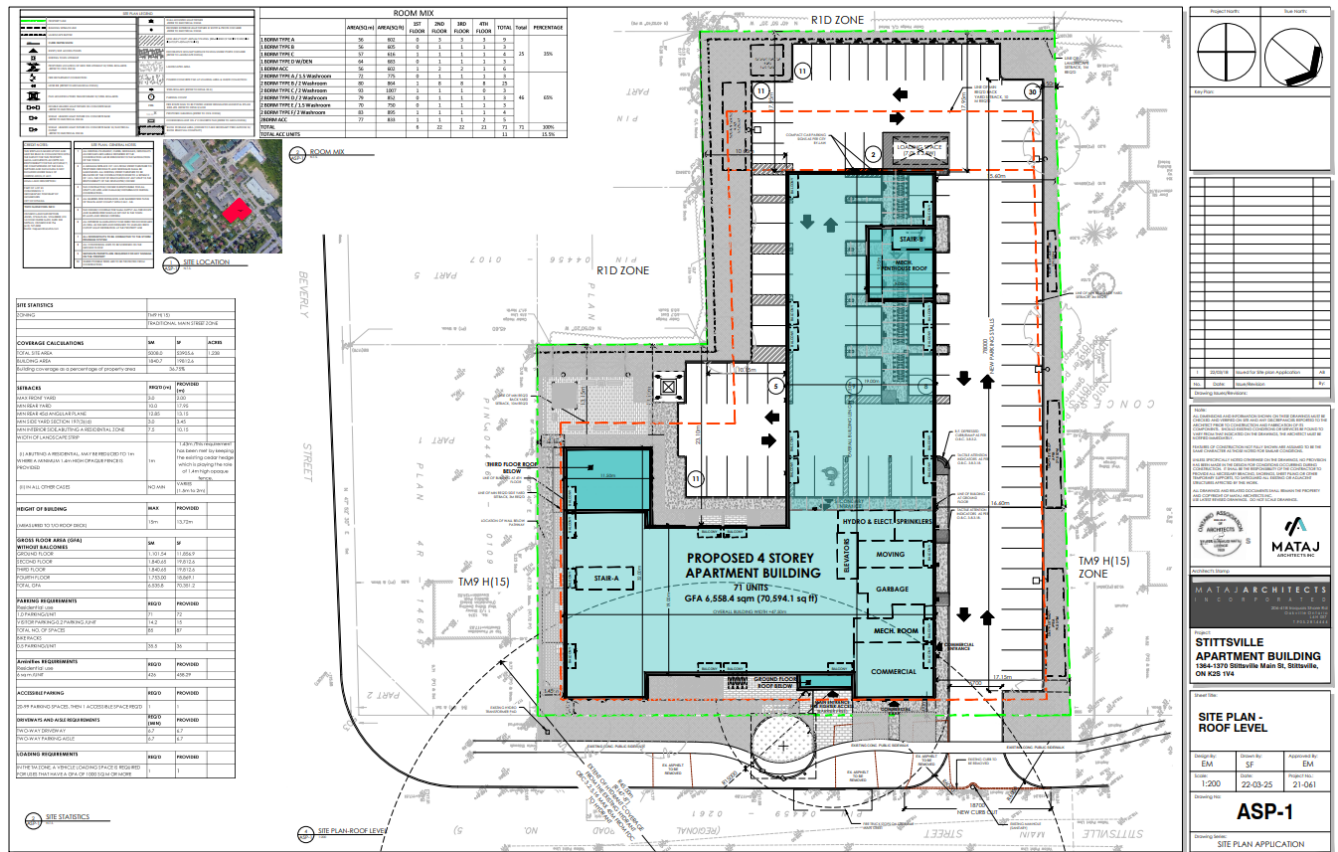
Site Plan for 1364-1370 Stittsville Main Street
